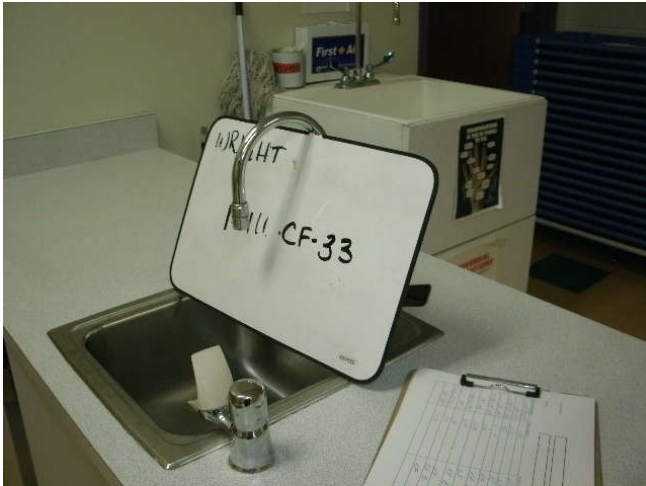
Classroom faucet w/bubbler, located on the 1st floor, in room 111.
